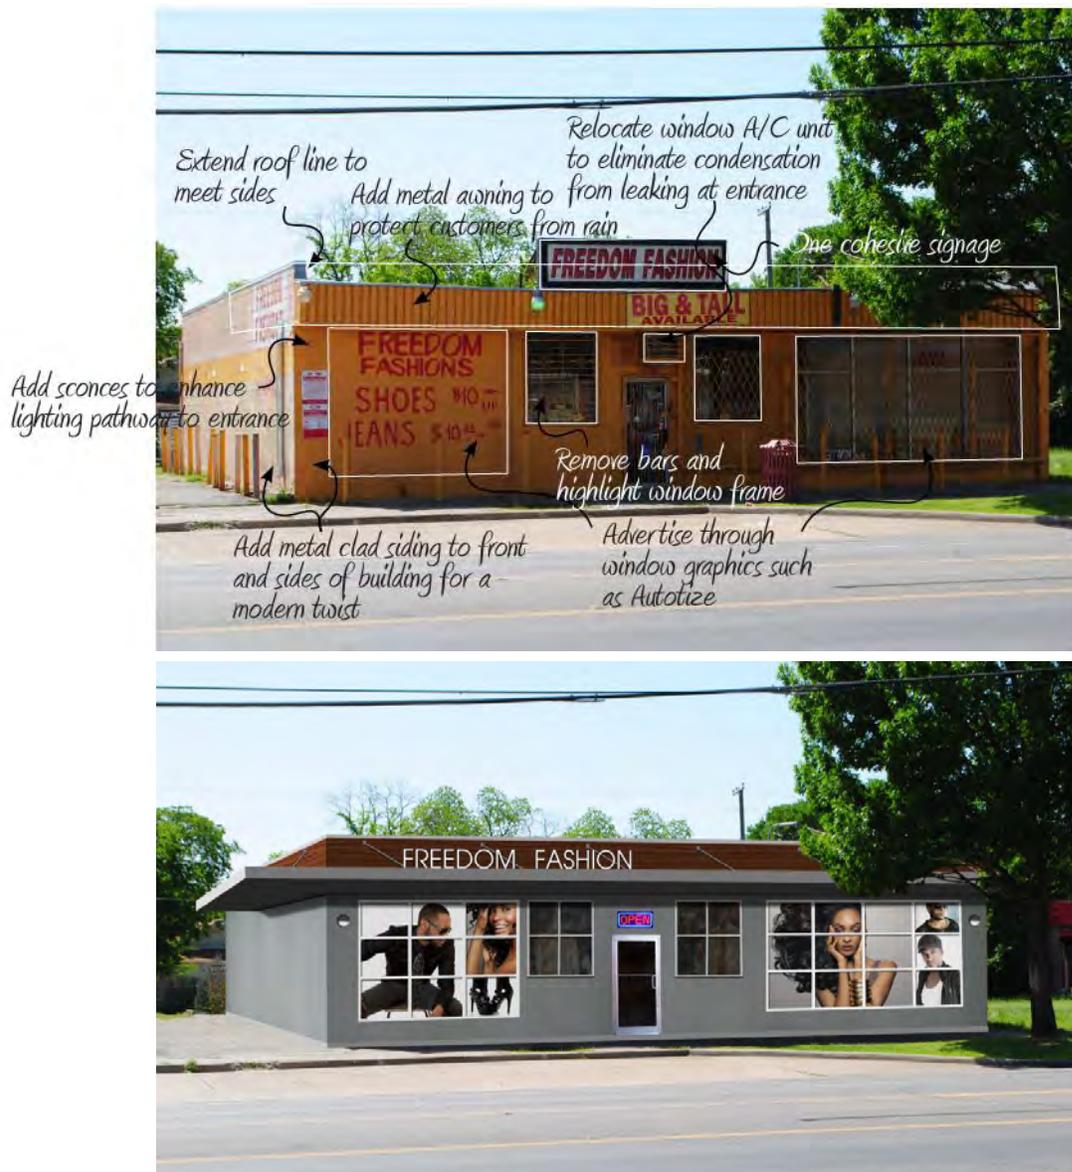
Case #1 - An Existing Building with Proposed Improvements
